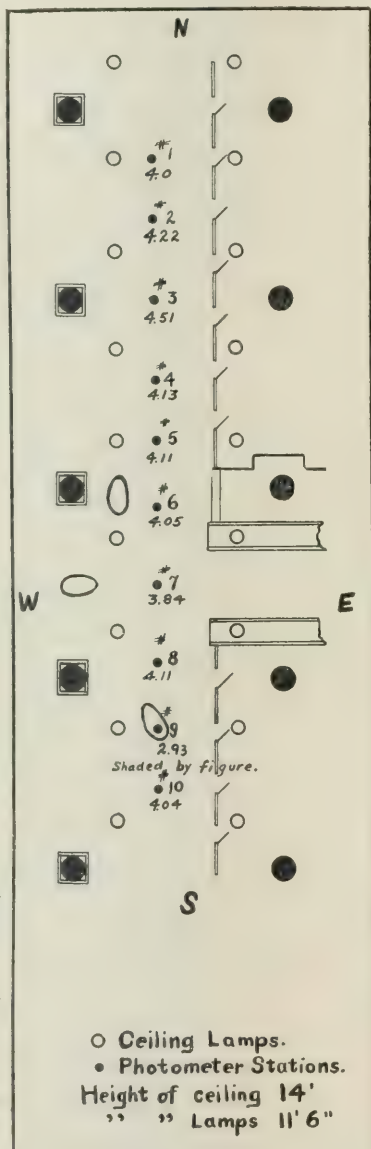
Section of third floor, (ladies' cloak and suit department), showing location of furniture, pillars, lighting units, test stations and illumination data.
